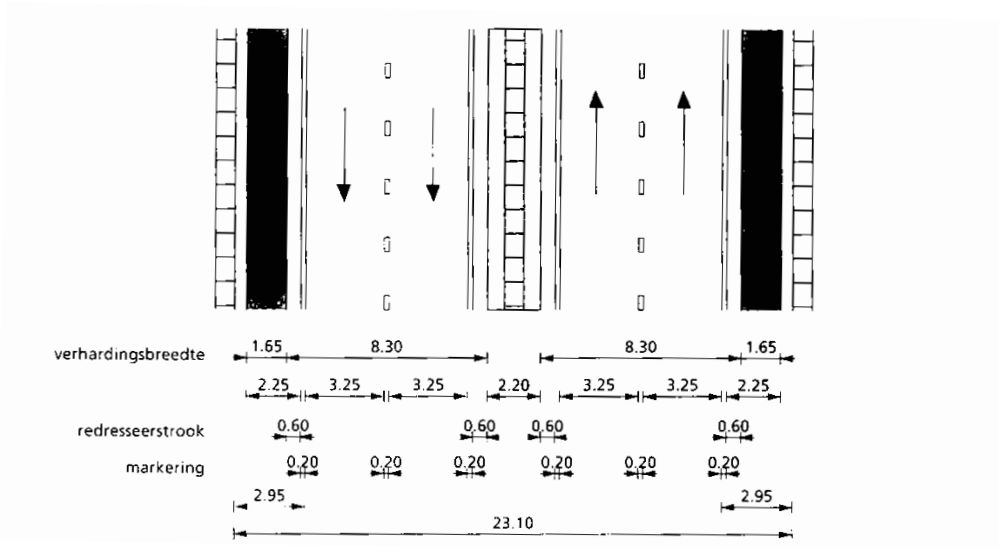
Typical dimension design for a Dutch 2×2 motorway [34]
